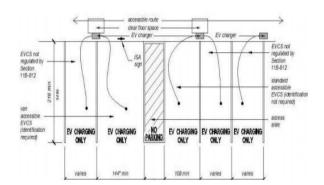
Sample layout with 5 EV Chargers, 1 Van Accessible Stall, and 1 Standard Accessible Stall
